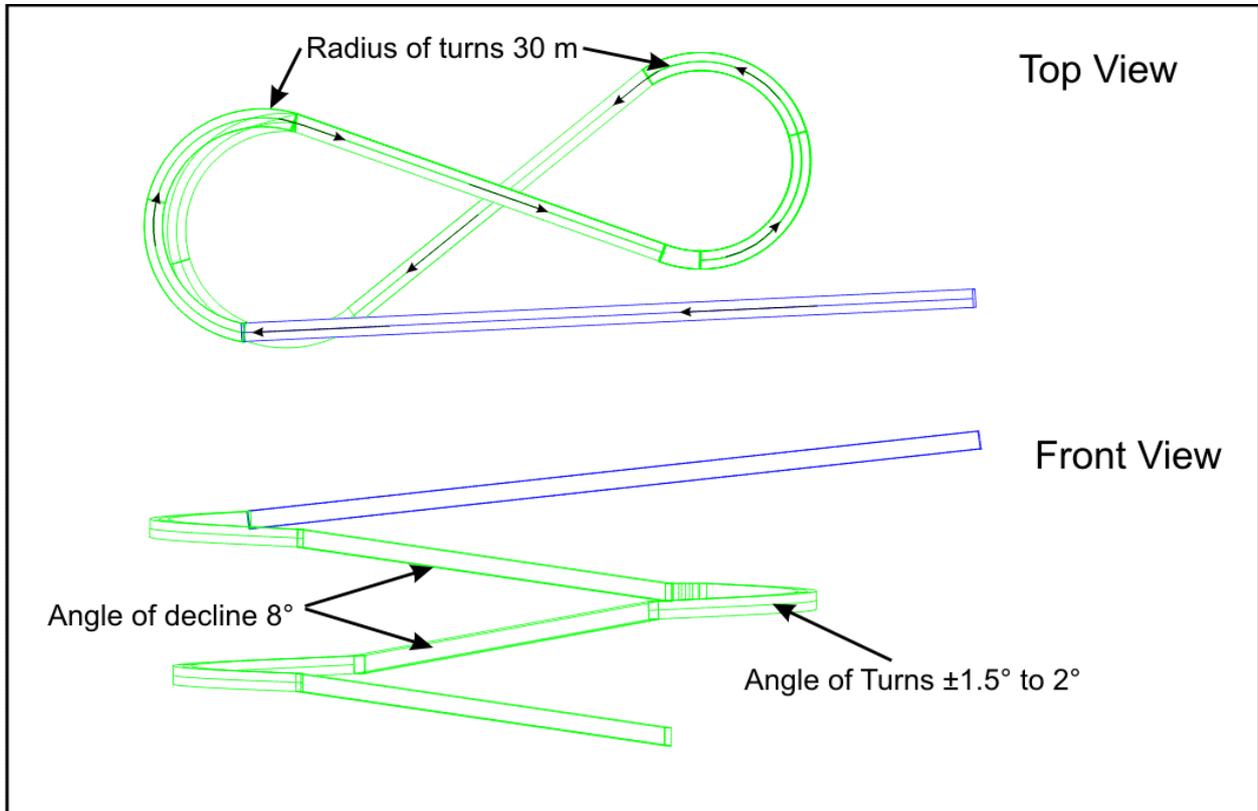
Schematic Plan & Elevation View of the Ramps
